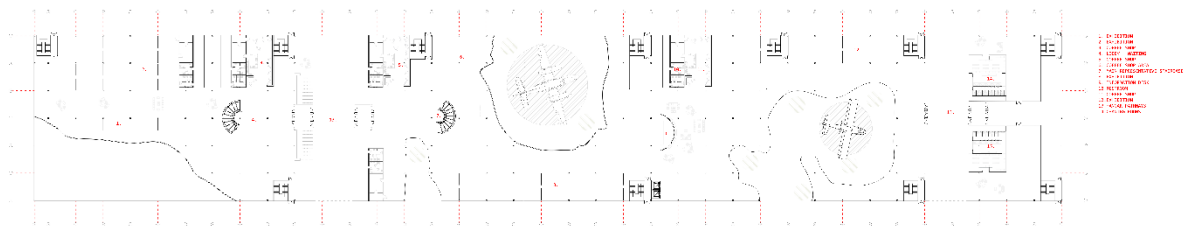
Ground floor plan with context. (Džiaugys, 2024)
